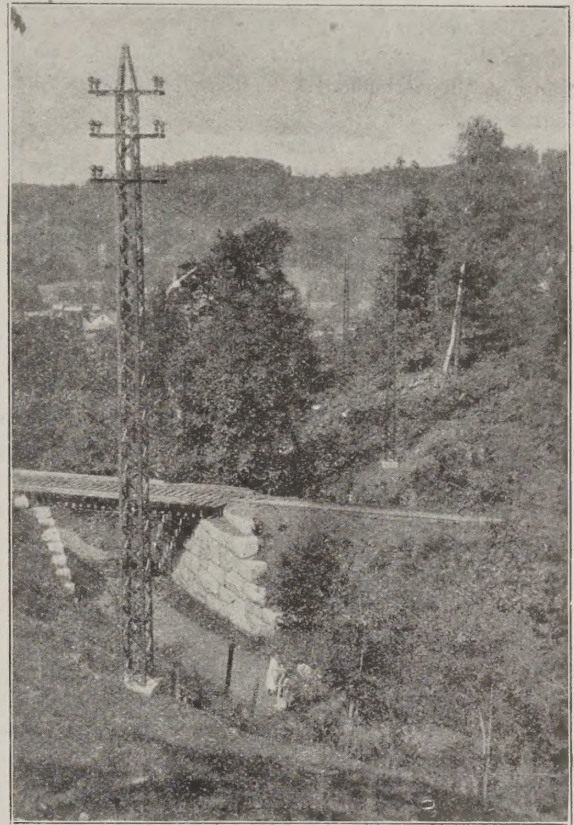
DOUBLE CIRCUIT STEEL POLE LINE WITH PIN TYPE INSULATORS SHOWING CONSTRUCTION FOR RAILROAD CROSSING.
